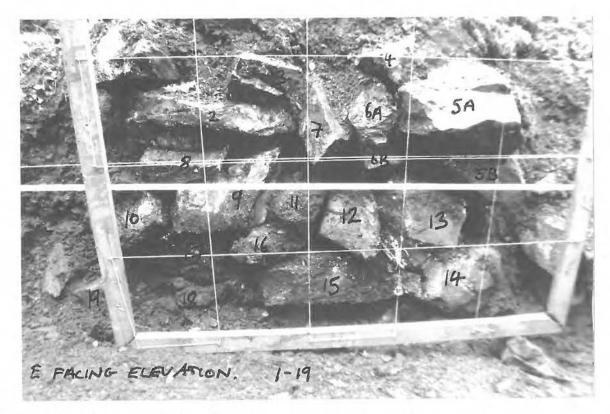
Adit E26, working shot showing numbering system employed in the reconstruction of the wall. The planning frame is 1.5 - 2.5m north of the adit mouth on the west side of the portal (GAT 1059/08/05, frame 1m).
